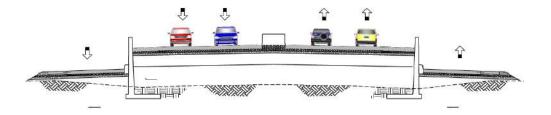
Typical Cross Section for Embankment w/ Side Road/Service Road
